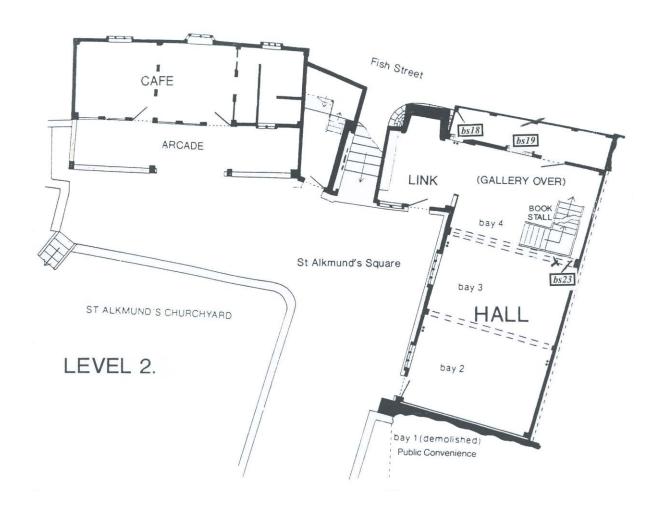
Ground-floor plan, showing the location of timbers sampled in Bear Steps Hall, Gallery, and The Orrel (after Moran 1989 © Shrewsbury Civic Society)
